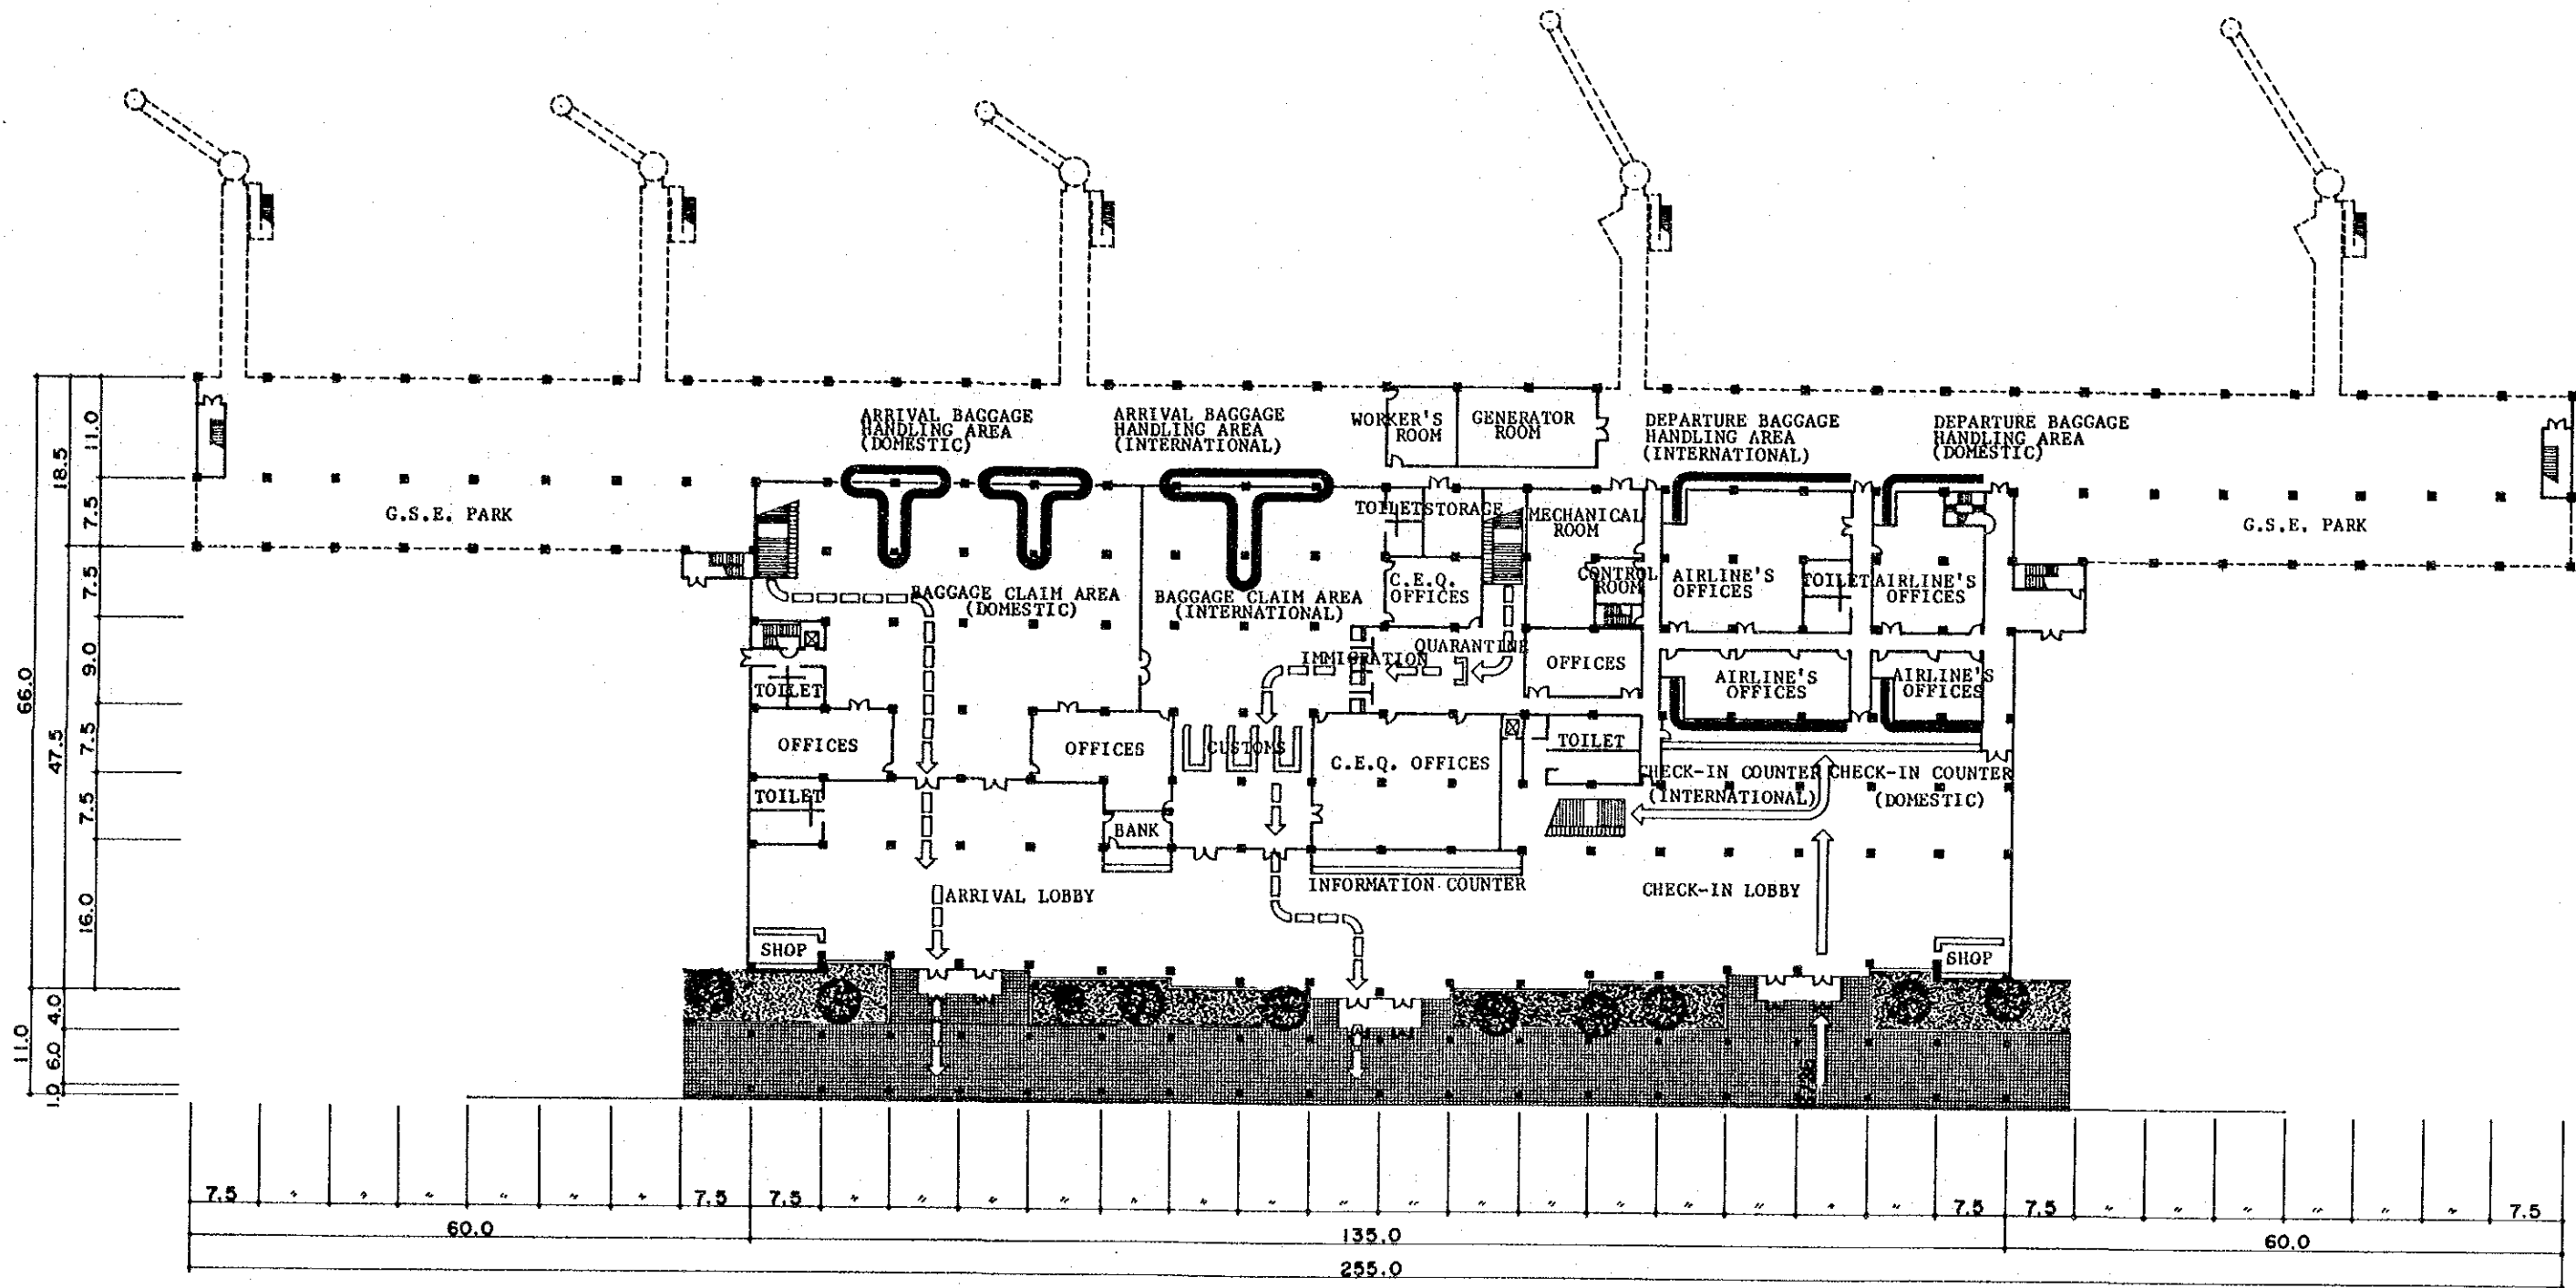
Passenger Terminal Building Ground Floor Plan
